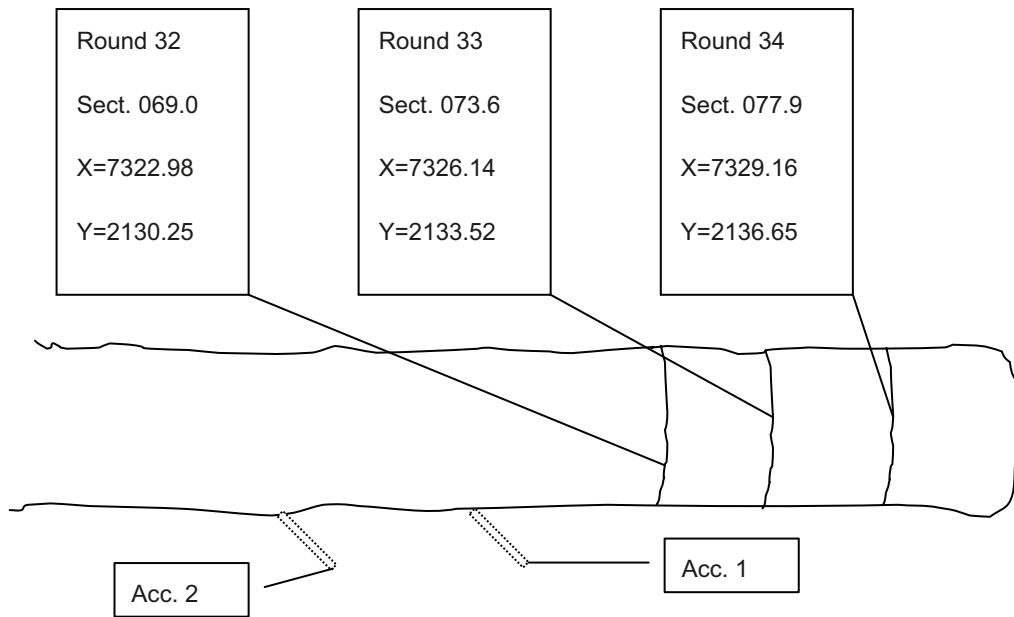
Layout of the accelerometer gauge holes and the sections along the tunnel wall (Figure not to scale).
